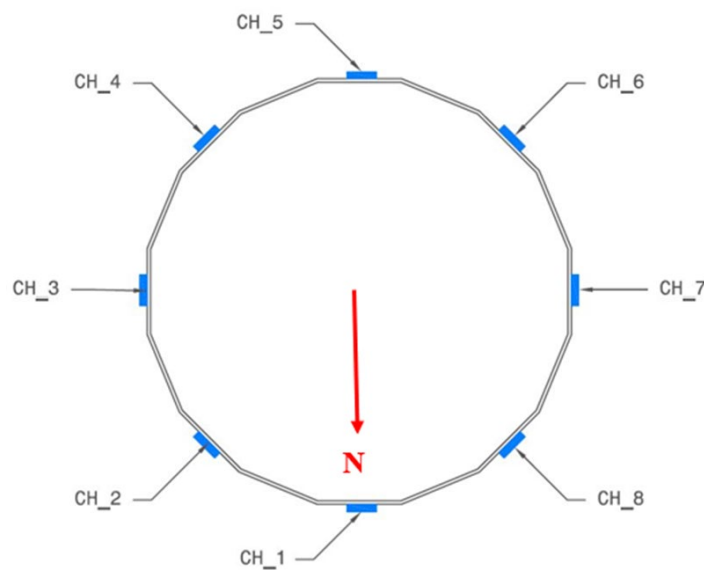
Sketch showing installation of strain gages on tube wall cross-section
